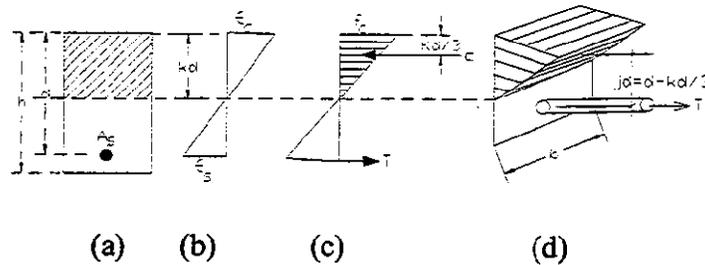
Internal forces in a single reinforced rectangular section (Hassoun 1998).
